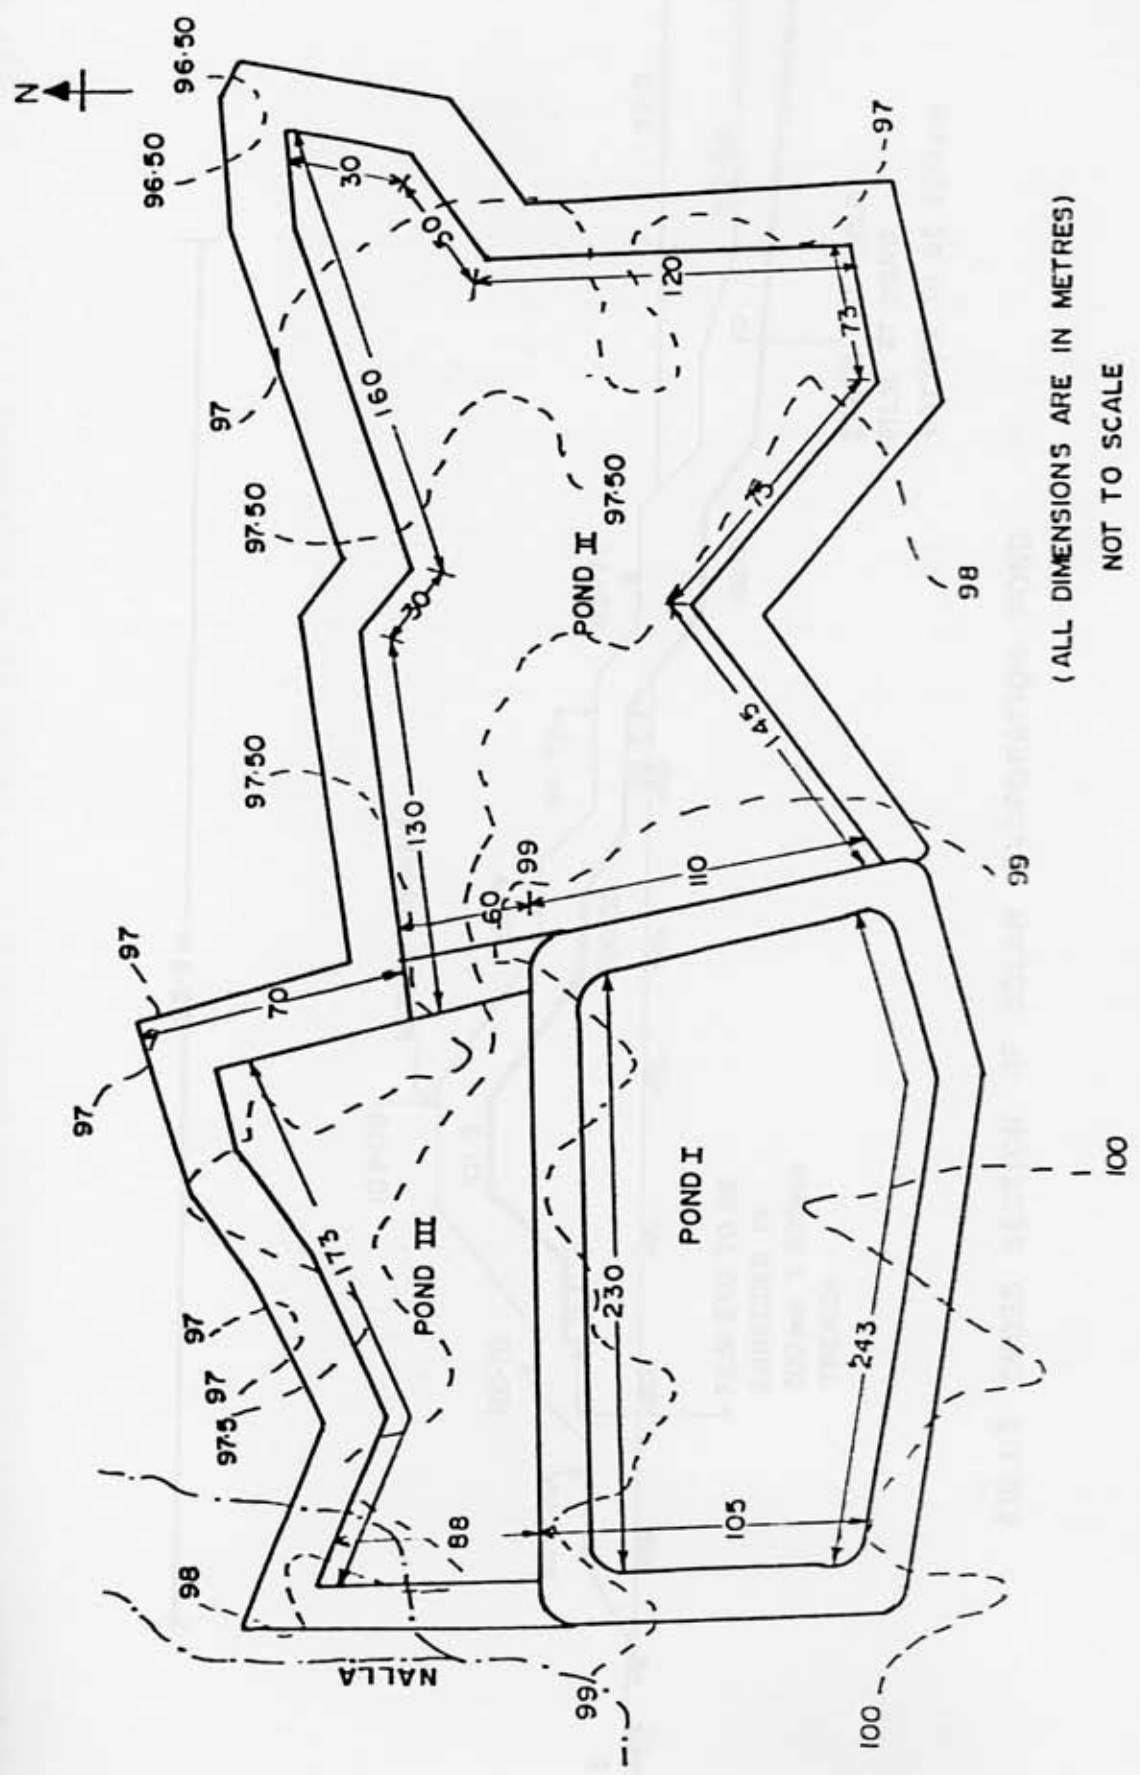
DETAILED PLAN OF SOLAR EVAPORATION PONDS
